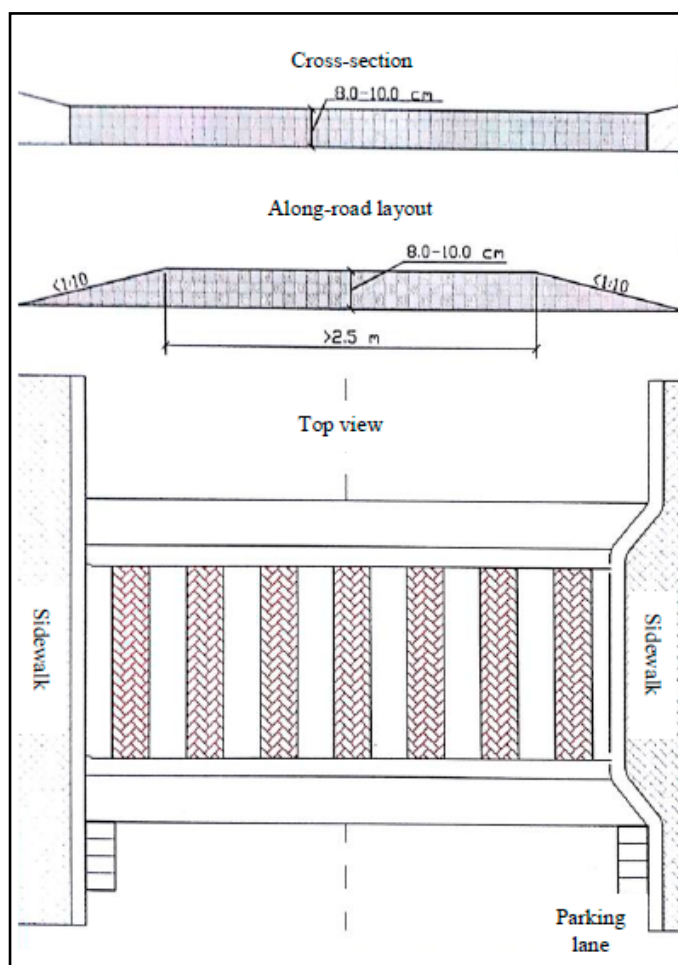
Typical layout of a raised crosswalk according to Israeli guidelines (MoT, 2002).
